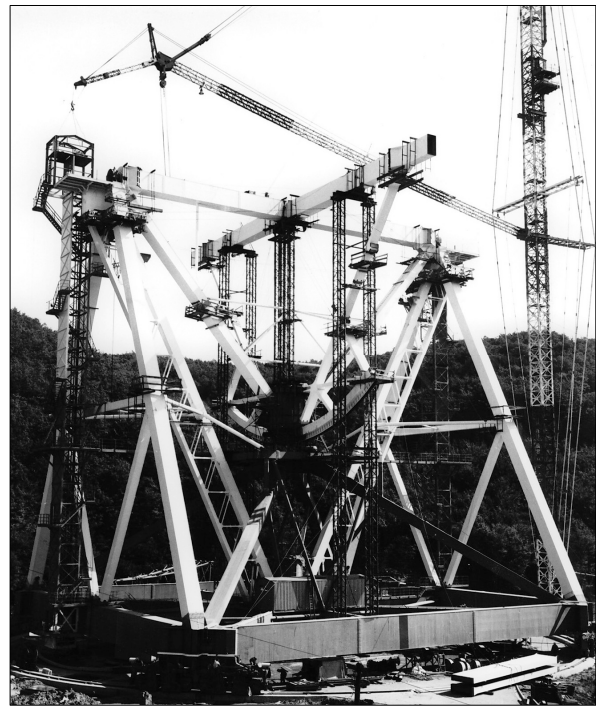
The A-frame support structure and the tipping section being assembled (1969). Note the cross structure in the centre where a flexible joint connects to the reflector structure.
